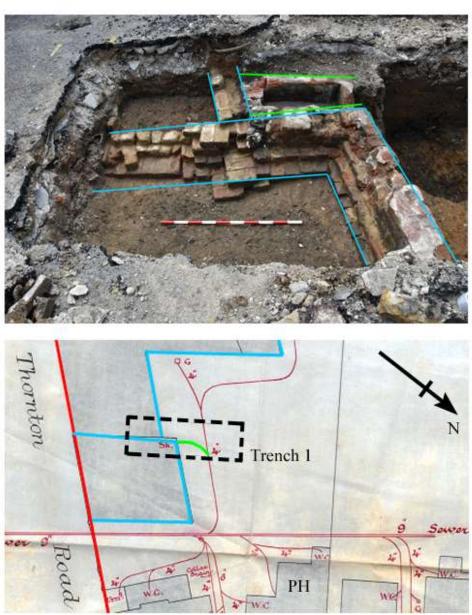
A comparison of the brick structure $\widehat{107}$ discovered in Trench 1, facing SW, and the layout of the building fronting Thornton Road, as recorded in the 1898 drainage plan
